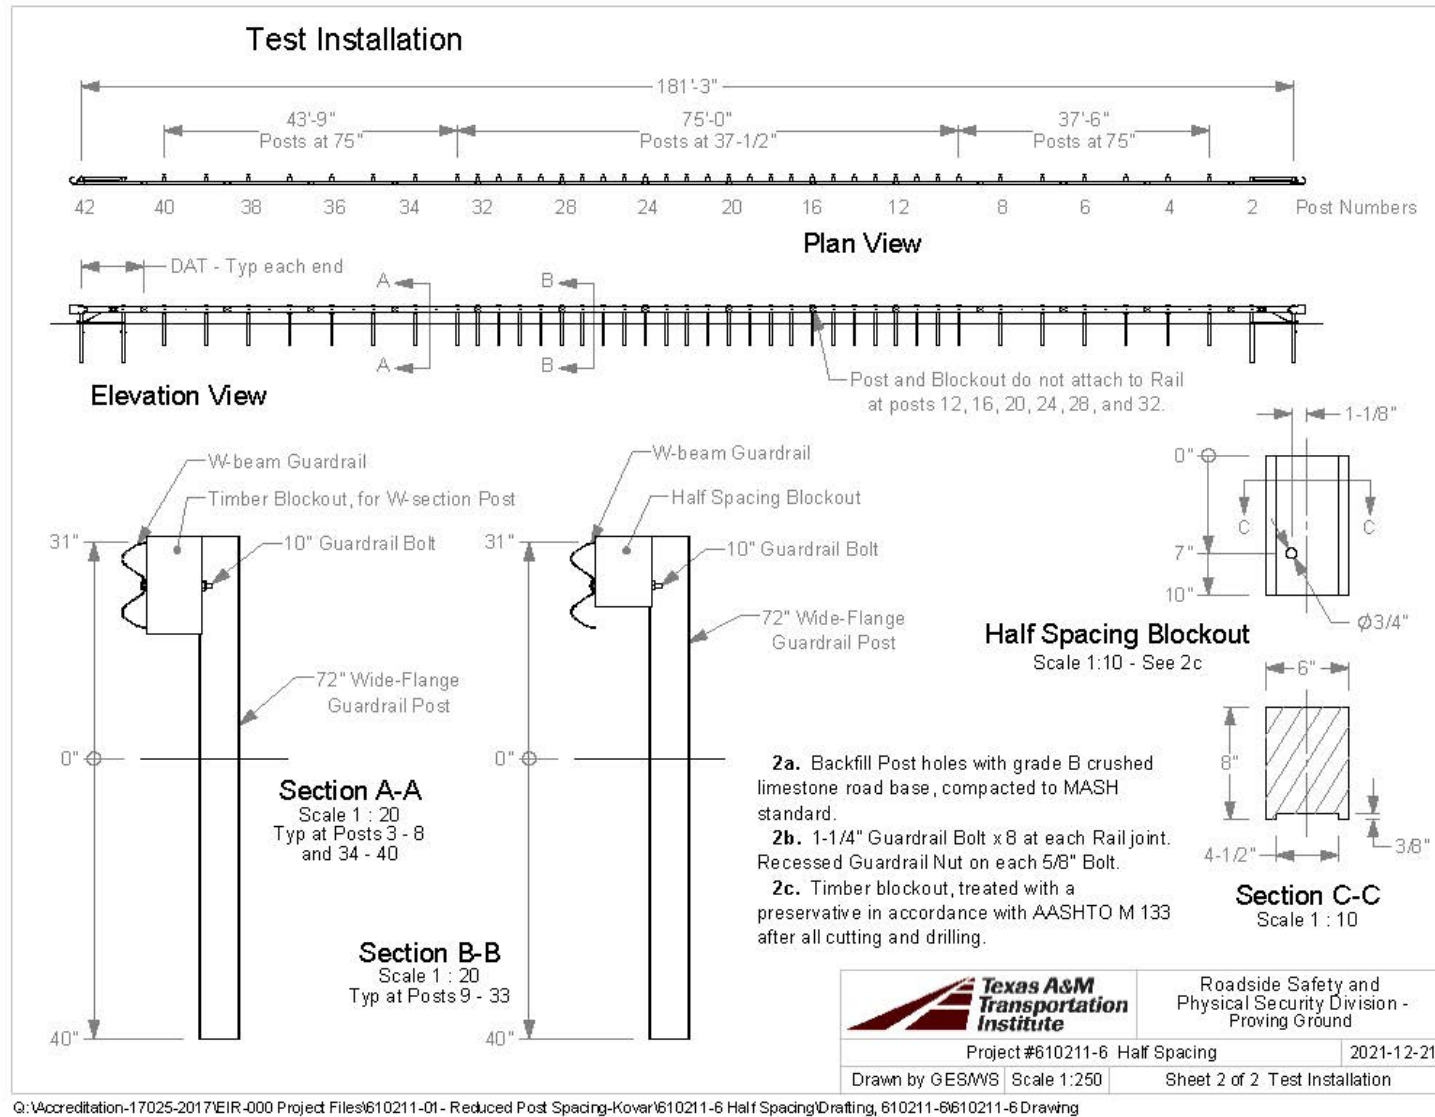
Details of the MGS with Half Post Spacing and Shortened Blockouts.
